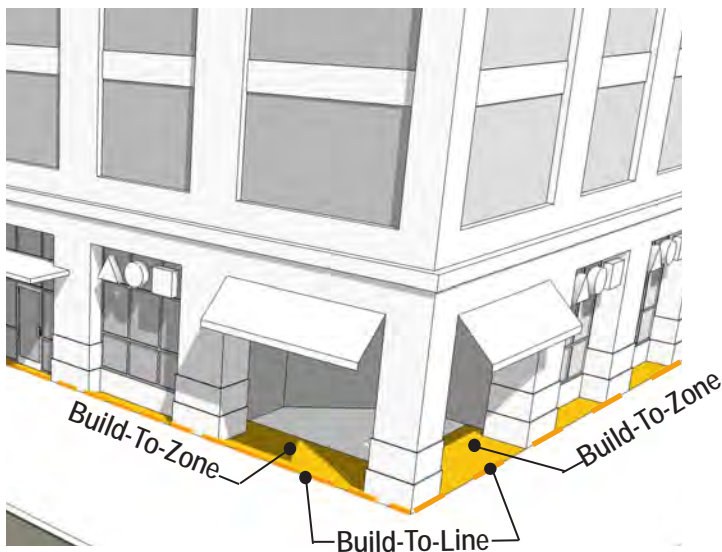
Street Frontages showing a typical Ten Foot Build-To-Zone on an A-street, and a typical Fifteen Foot Build-To-Zone on B Street
